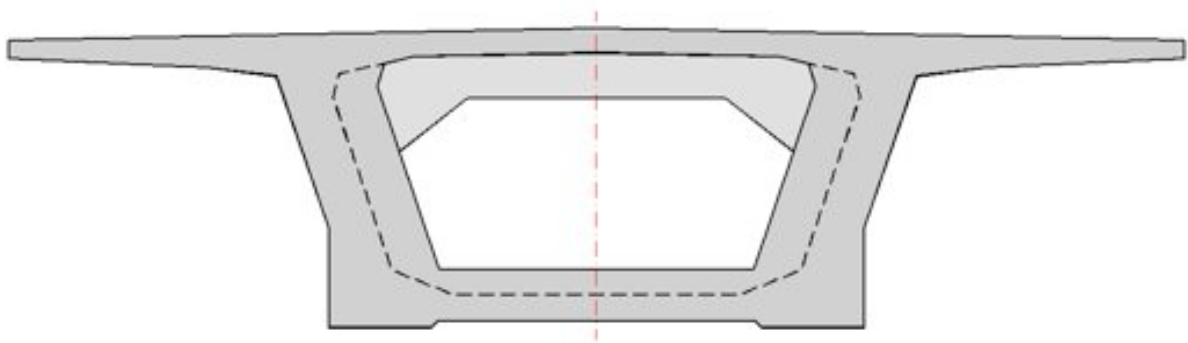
Detail of diaphragm to allow passing of internal formwork.
